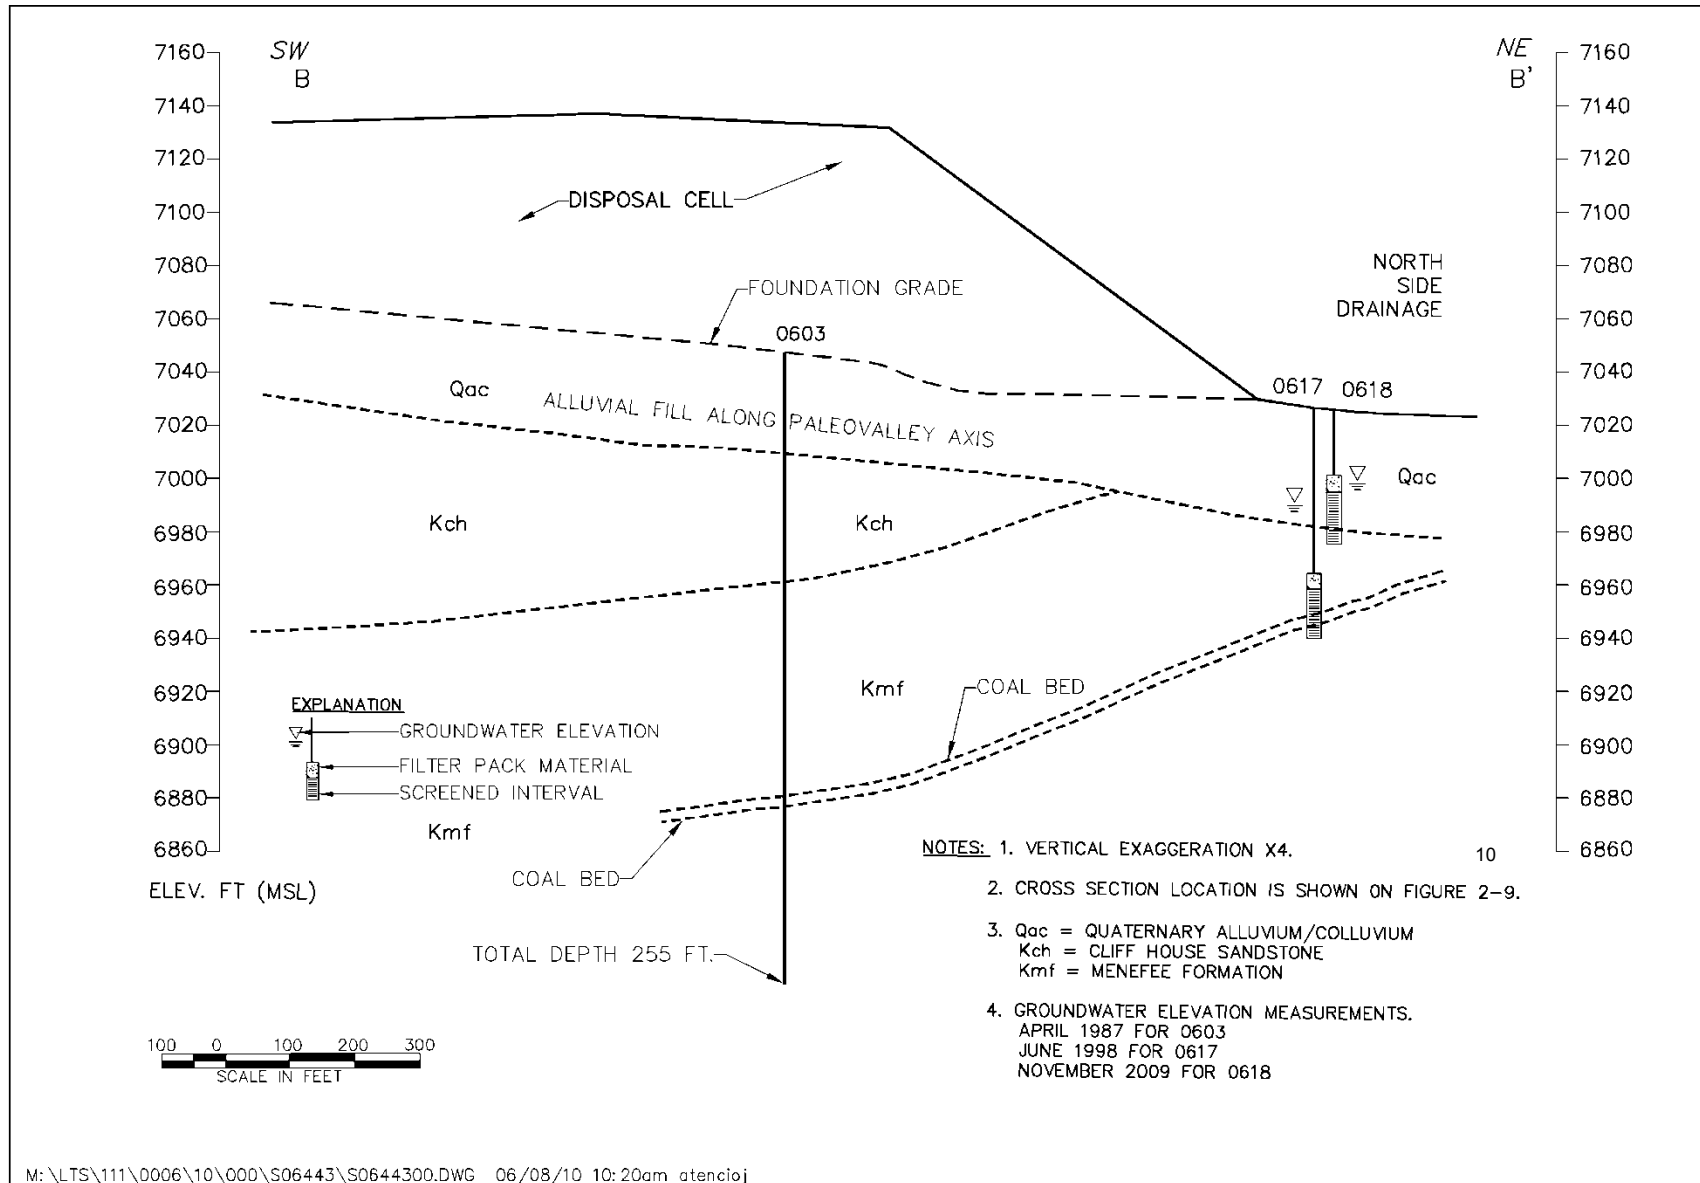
Cross Section B-B' at the Durango, Colorado, Disposal Site
